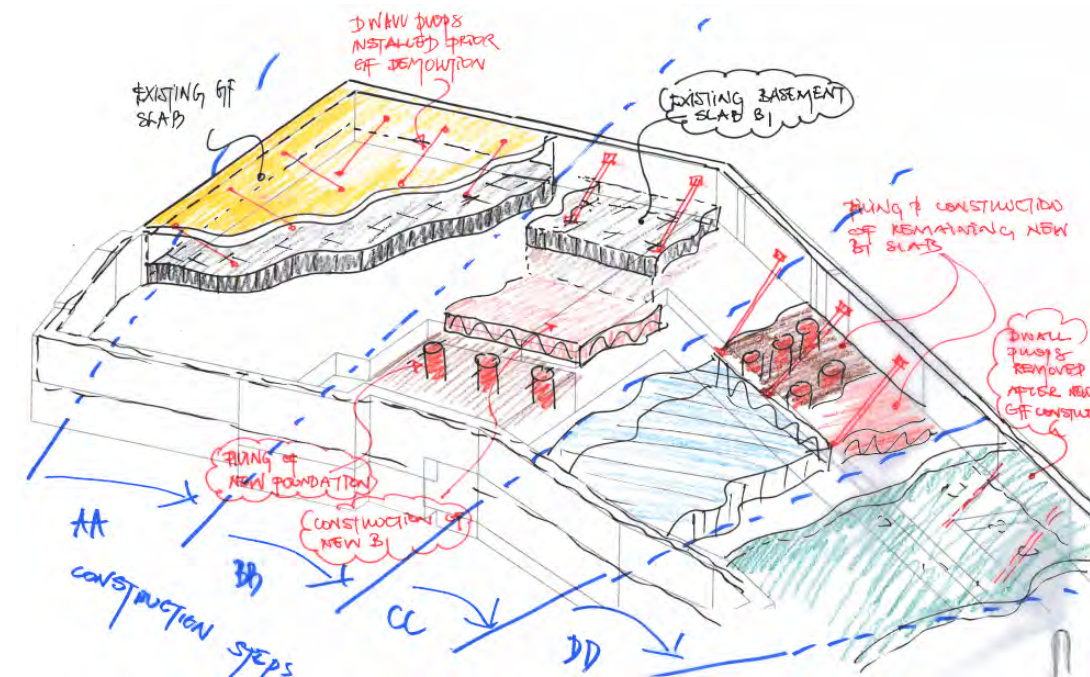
Indicative sketch of new basement construction in 4 main work steps
